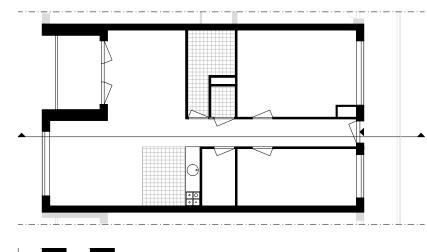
Typical floor plan of a dwelling. There is a big hallway with bedrooms and a badroom that ends up in the living room.
